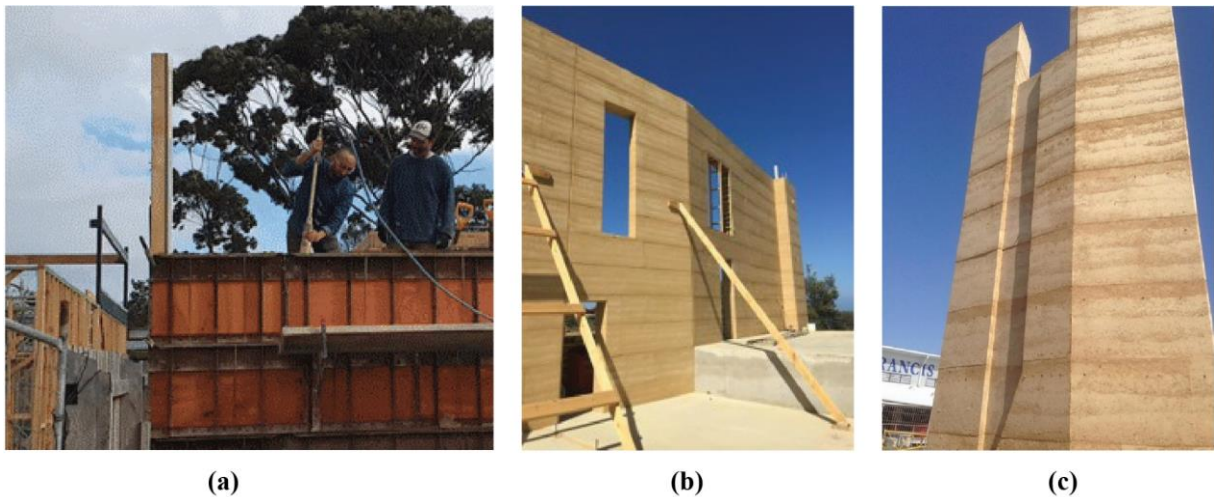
RE construction: (a) ramming process for a RE wall by the author in 2023, (b) curing and lateral support for a RE wall after demolding, and (c) a build RE wall. (Image (b) and (c) provided by and reproduced from [17])
